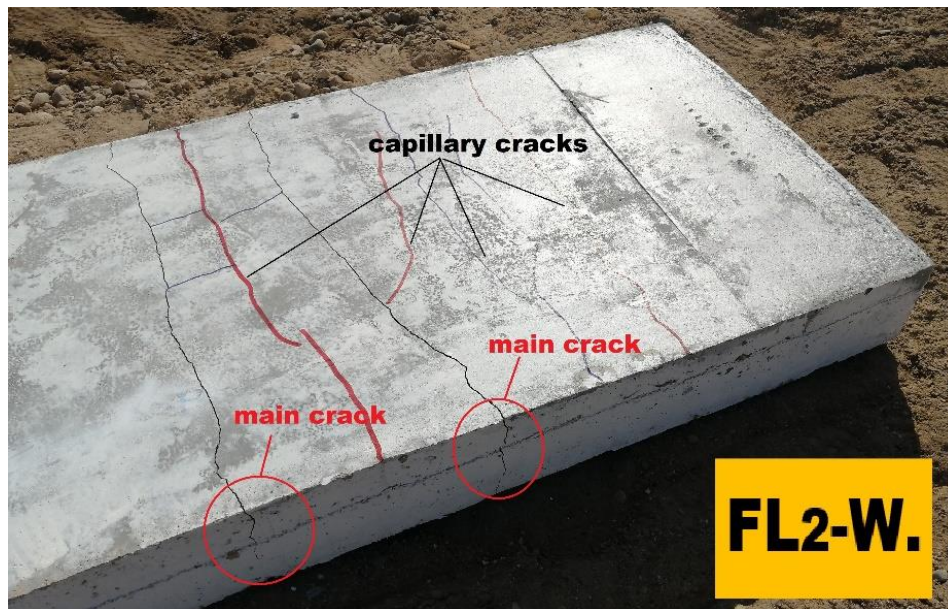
Mode of failure and crack patterns for specimen FL2-W.
